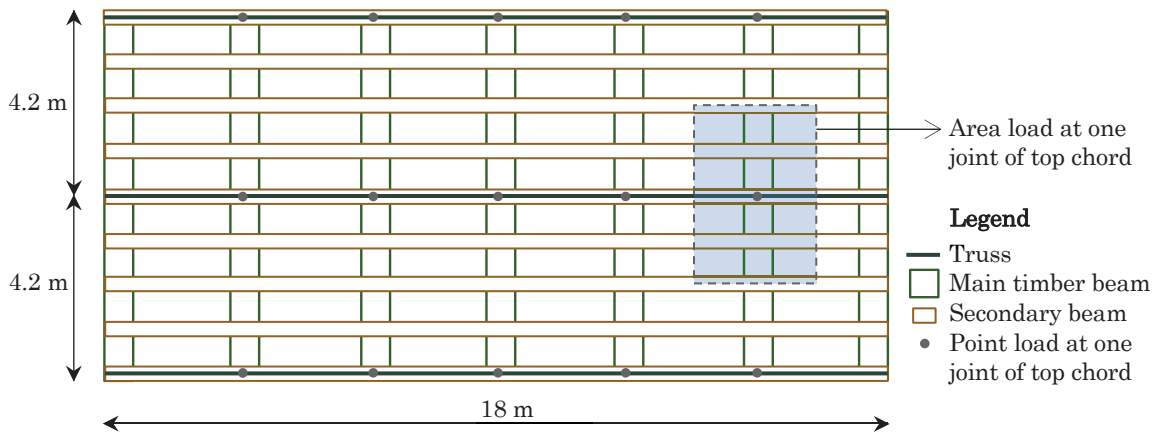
Plan of a unit roof containing three trusses for the calculation of point loads of the roof.
